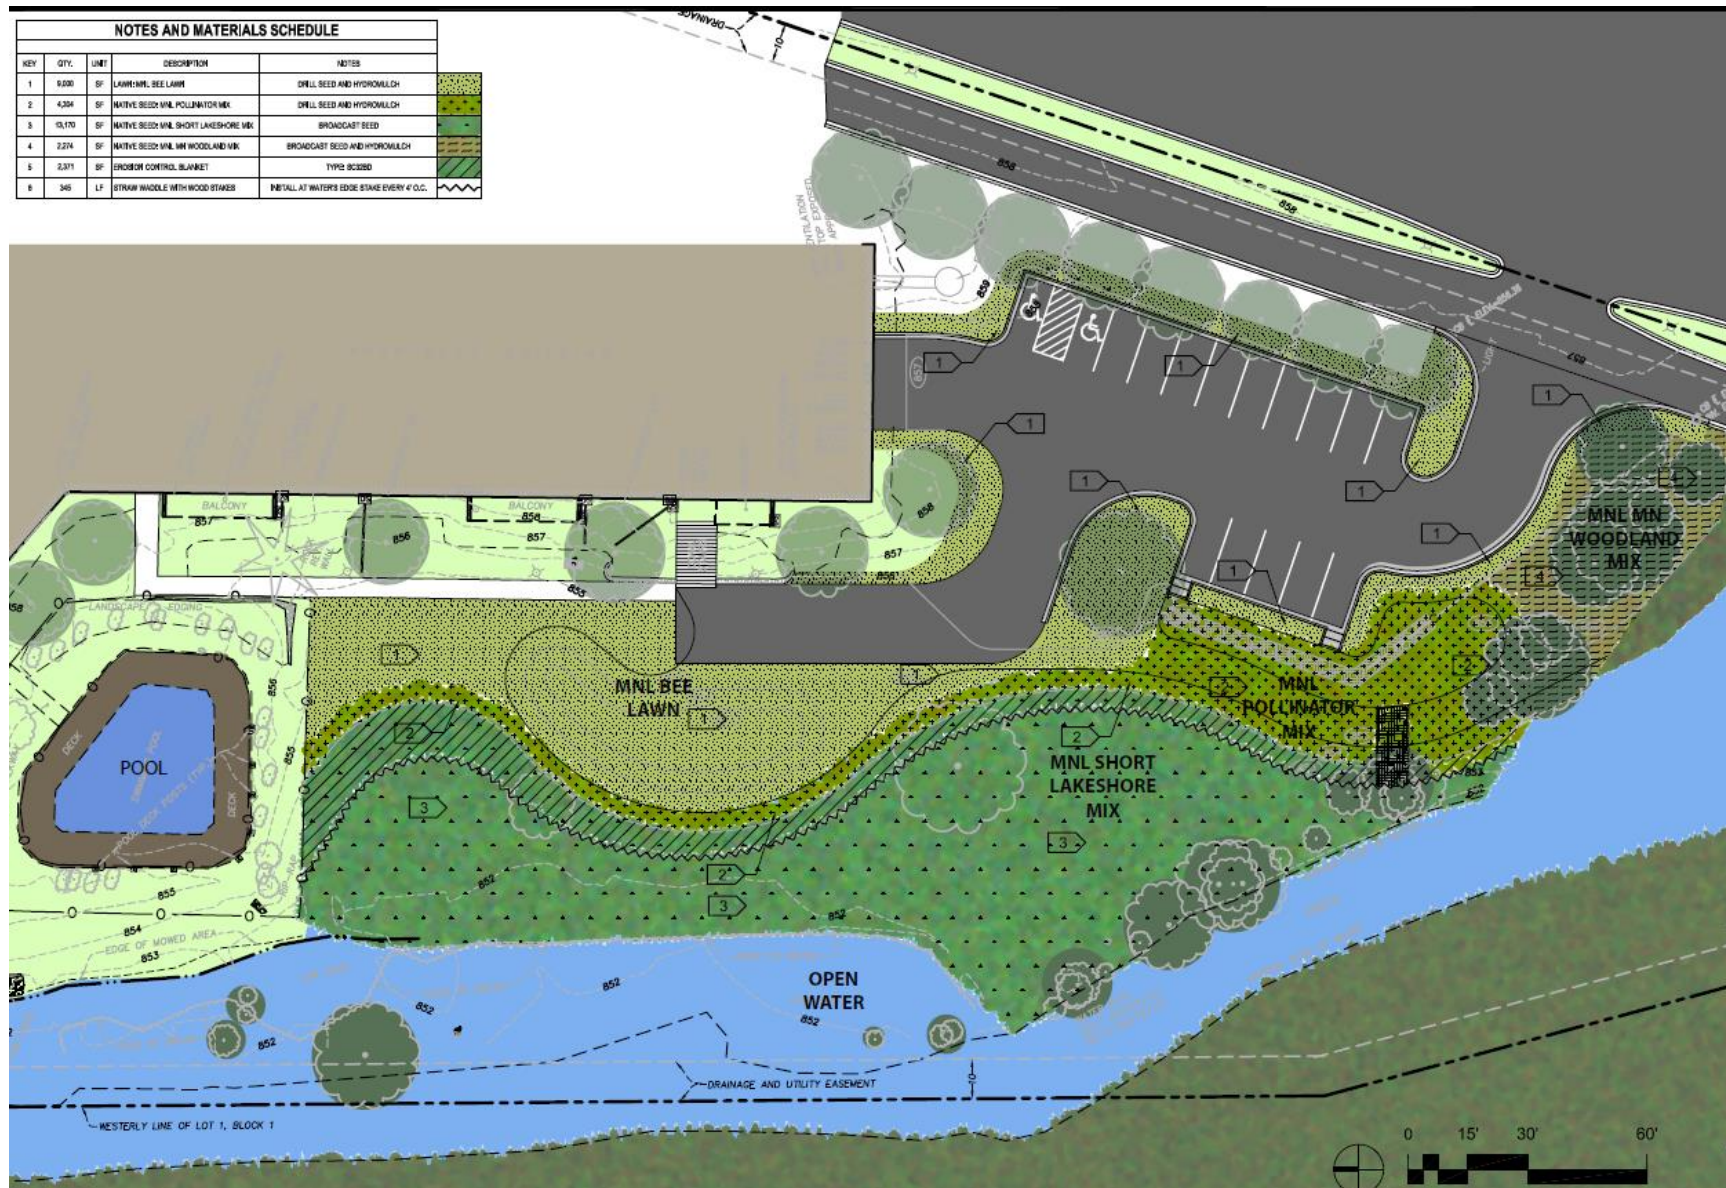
The old parking lot area will be restored with native plantings and a bee lawn.
